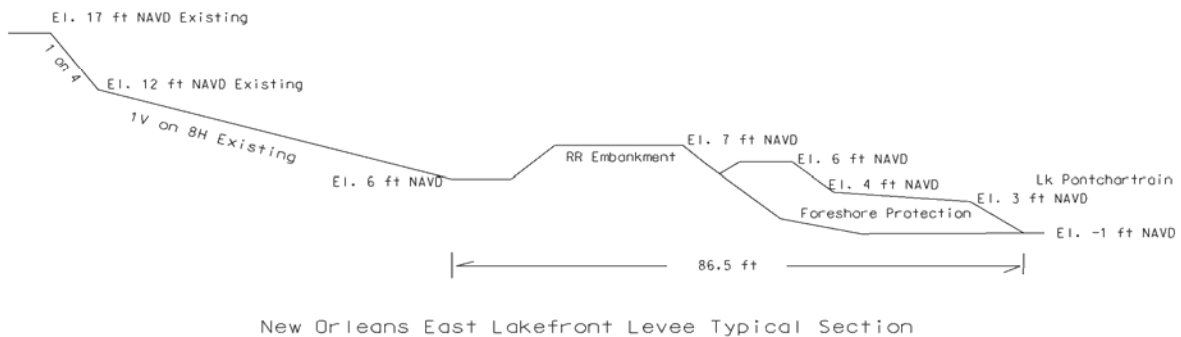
Current cross-section profile New Orleans East Lakefront Levee (NE02).
